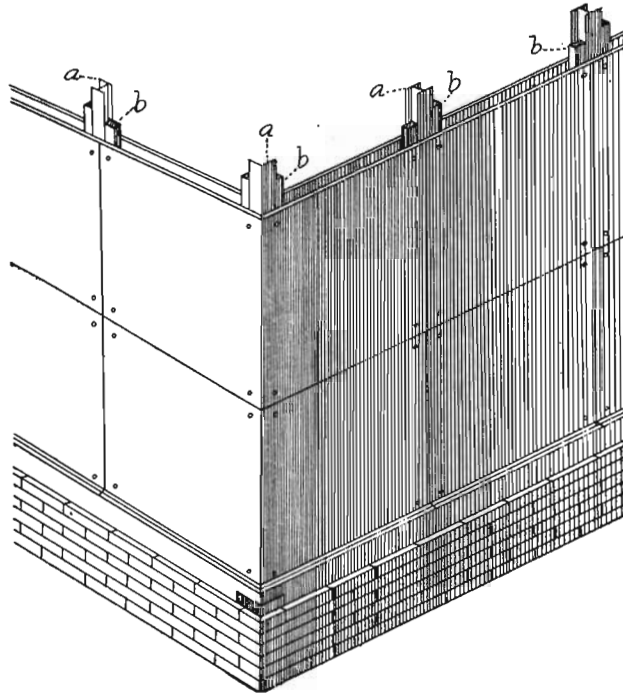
Gypsum boards fastened to narrow wooden strips in iron uprights. Such a wall is practically fire proof.
